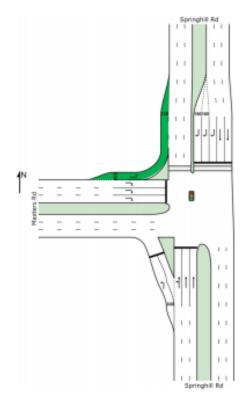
Proposed Masters Road / Springhill Road intersection upgrade
